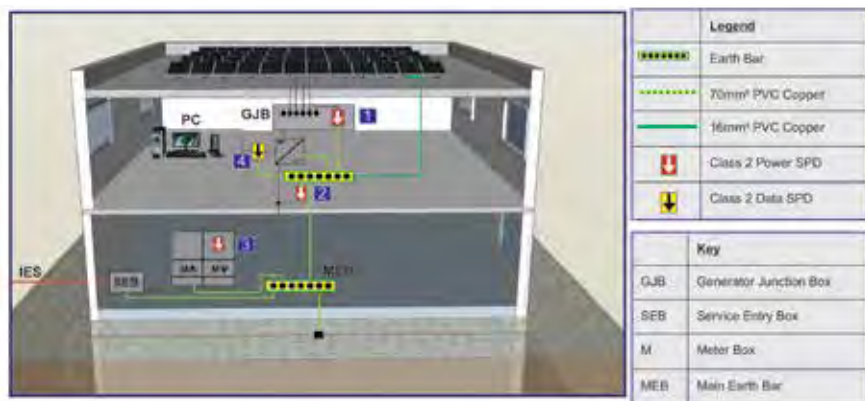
On buildings where a structural LPS is not required, surge protection measures must be applied on the solar PV system and it must be bonded to the building's electrical earthing system.
